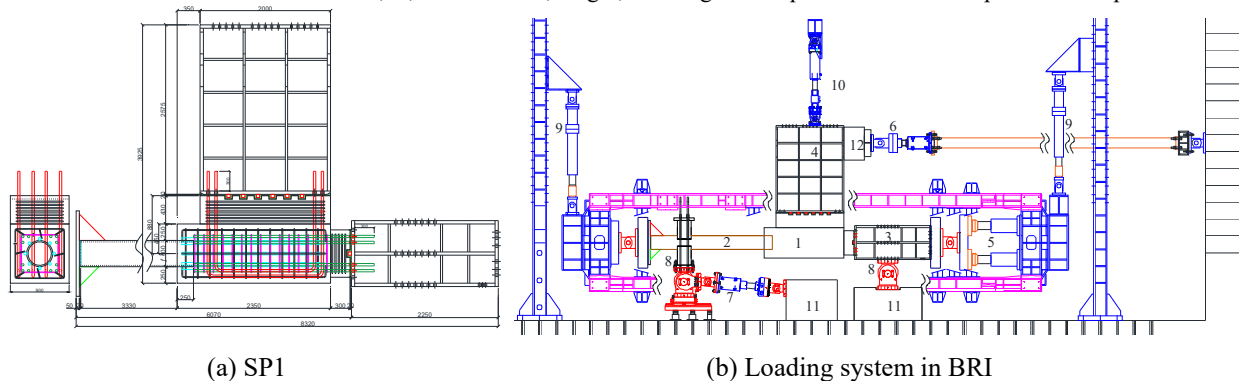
Pile and Pile cap assemblage specimen and loading system [10]
